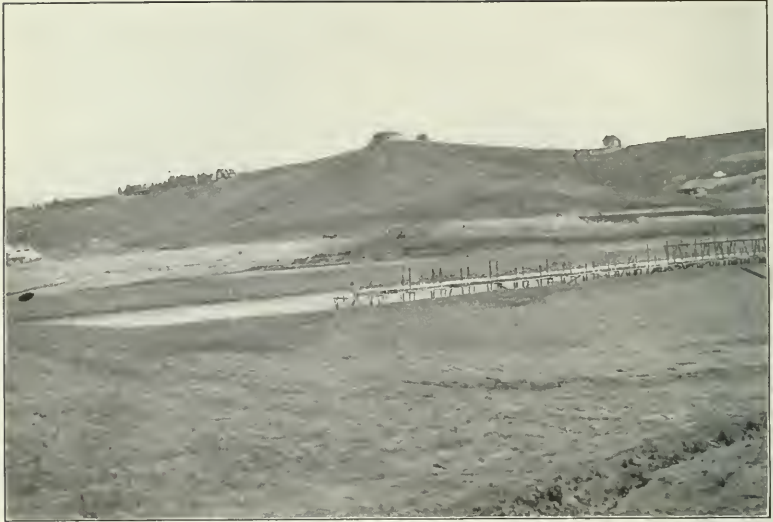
SILVER LAKE DAM, LOS ANGELES. FROM THE LOWER SIDE, SHOWING THE PUMPING STATION WHENCE THE LIQUID EARTH IS PUMPED TO THE DAM.
